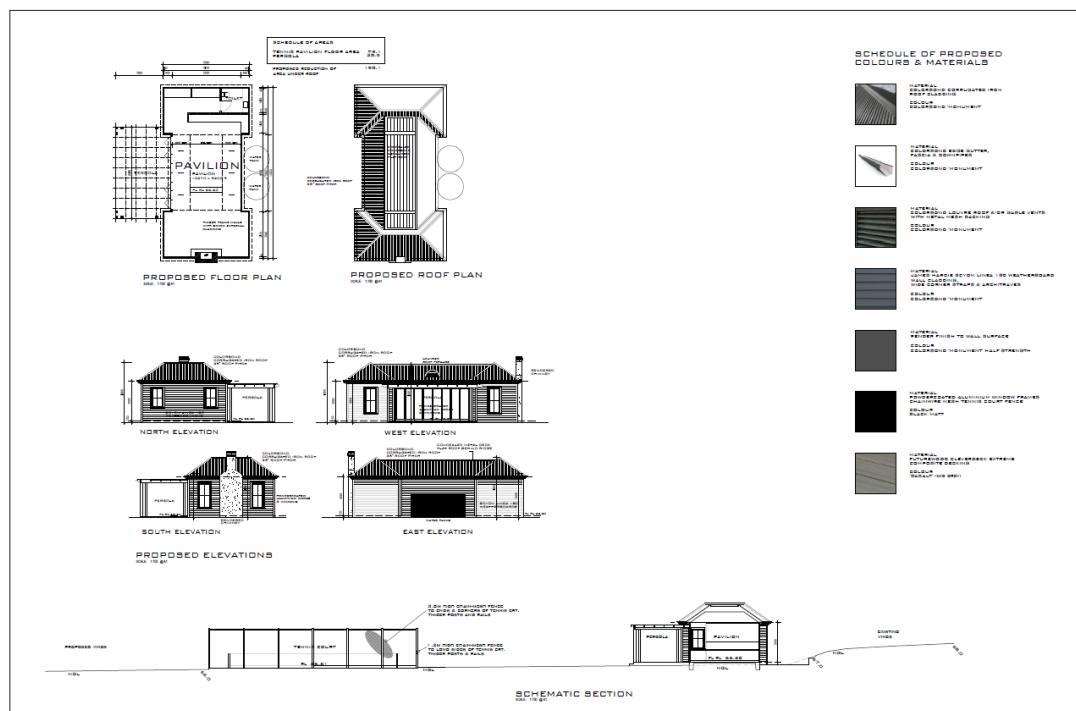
Layout / elevations of proposed pavilion (source: Development Plans 2024)
